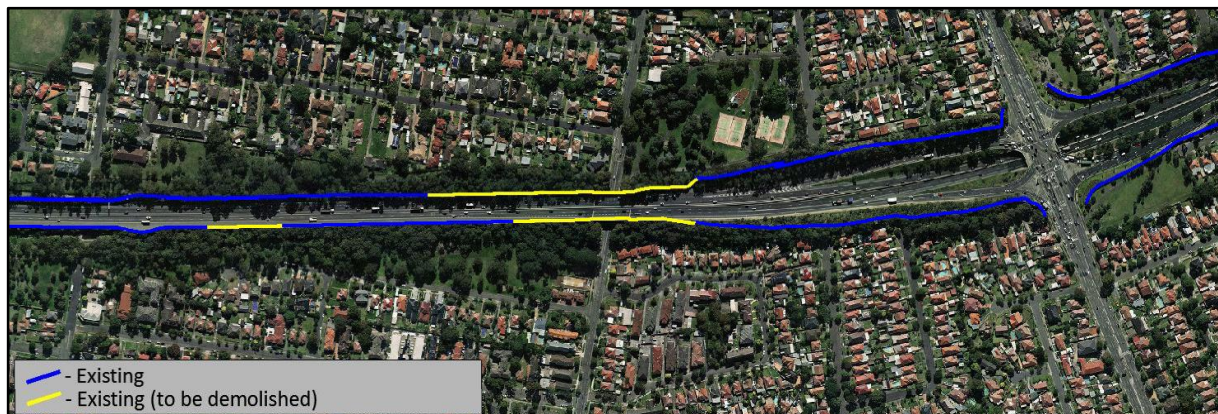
Existing noise barriers to be replaced (near Cooloongatta Road Bridge)
